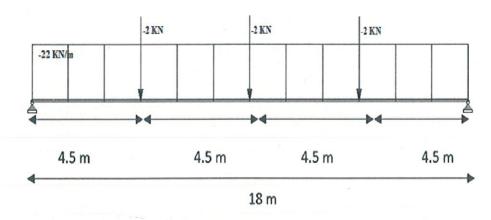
DEAD LOADS ON PLATE GIRDER
